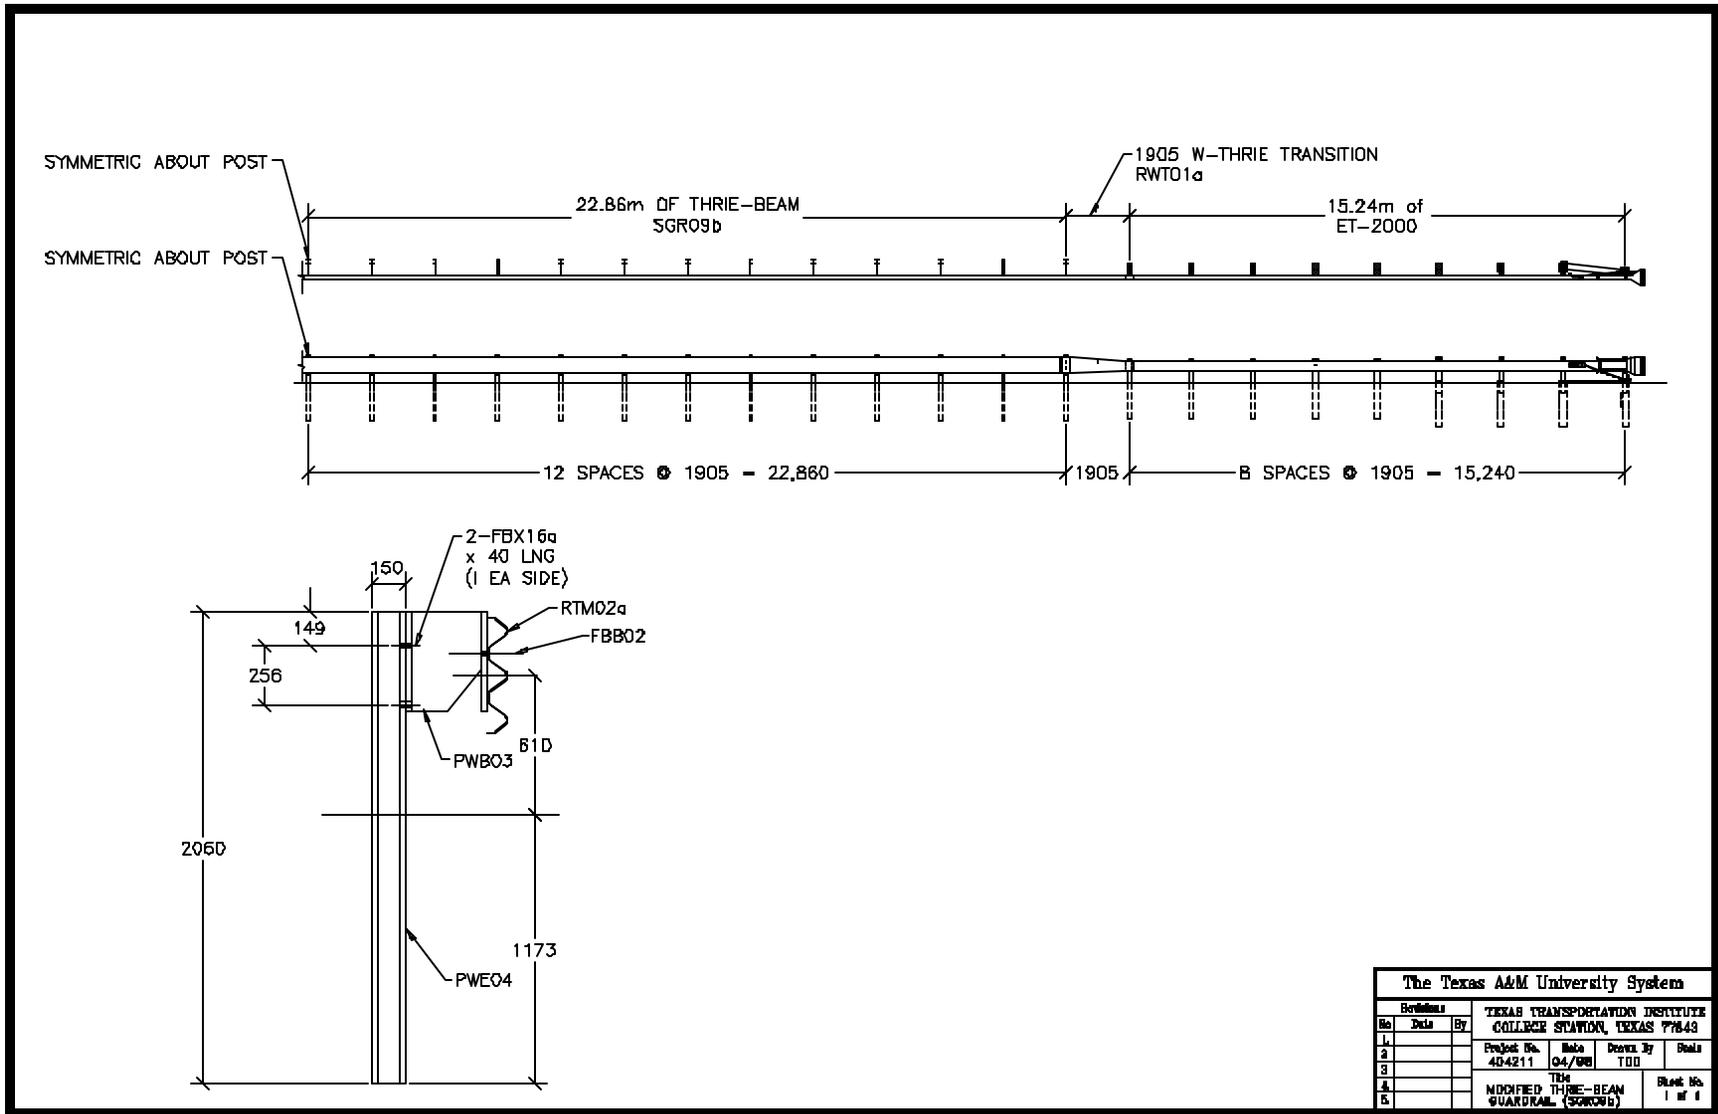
Details of the Modified Thrie Beam Guardrail installation.
